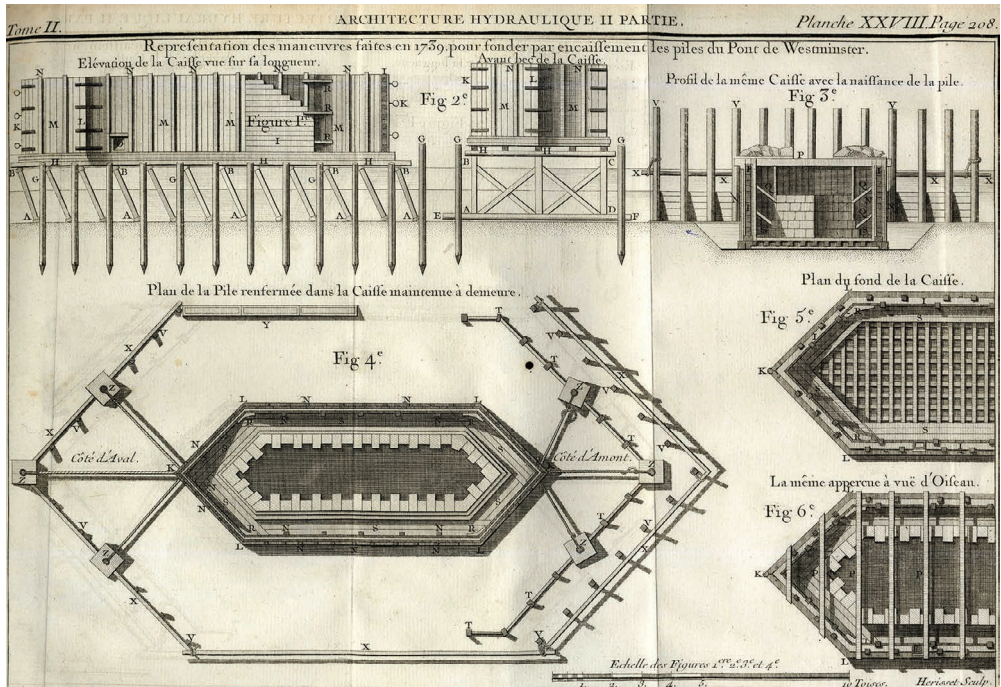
Caissons for the piers of Westminster Bridge (Belidor 1753: Plate XXVIII).
